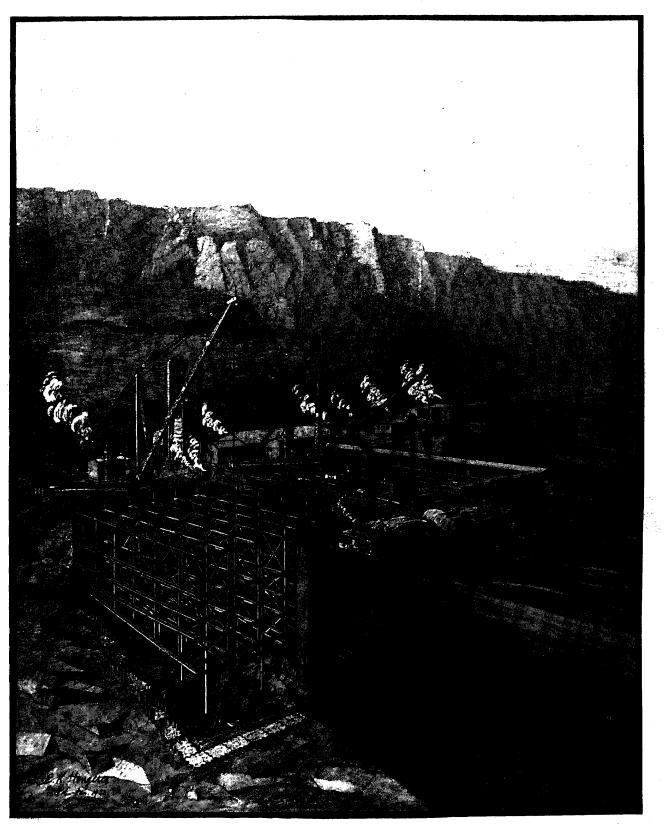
Cofferdam for the west pier of George Washington Bridge.
